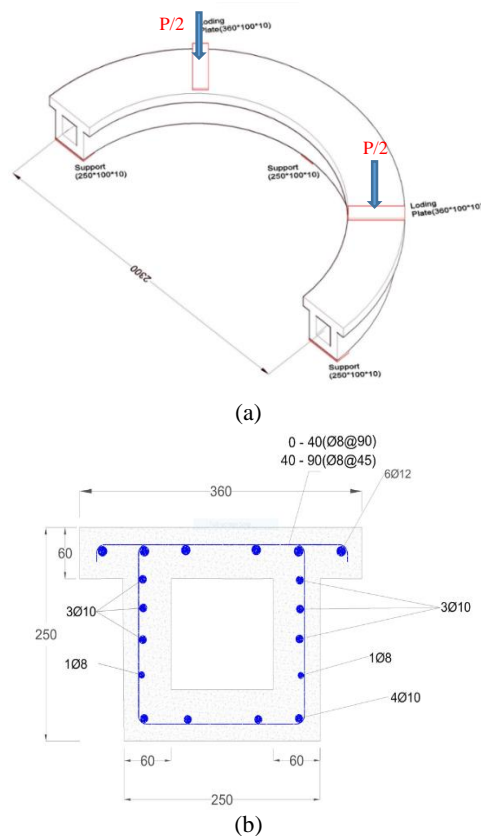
(a) Geometry and loading of all specimens (b) Cross section and reinforcement (all units in millimeters)
